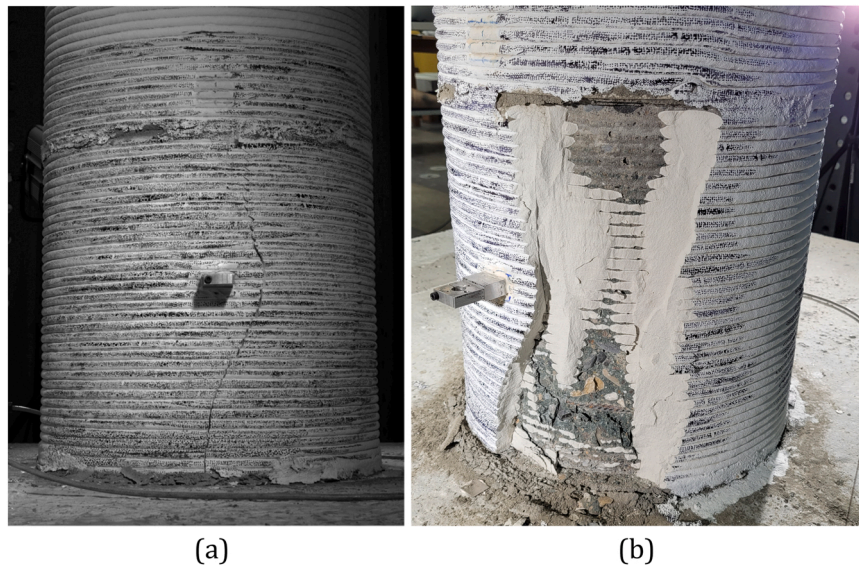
Failure of 3DPC formwork in Column S1 at 5% drift: (a) cracked formwork immediately prior to separation, (b) close-up showing the diagonal failure planes due to crushing of the unconfined zones to propagate into the 3DPC element.
